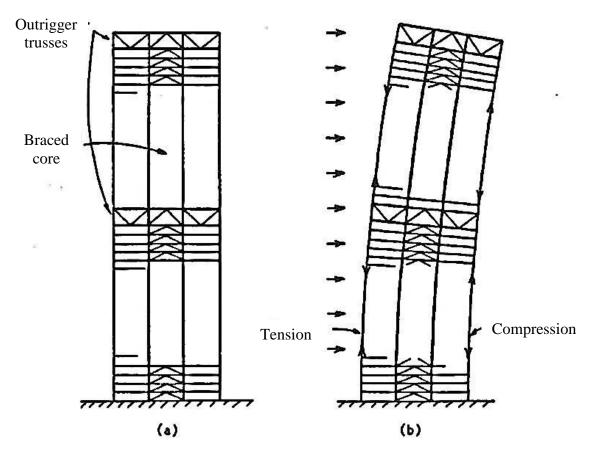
a) Outrigger-braced structure b) outrigger-braced structure under load [47]
